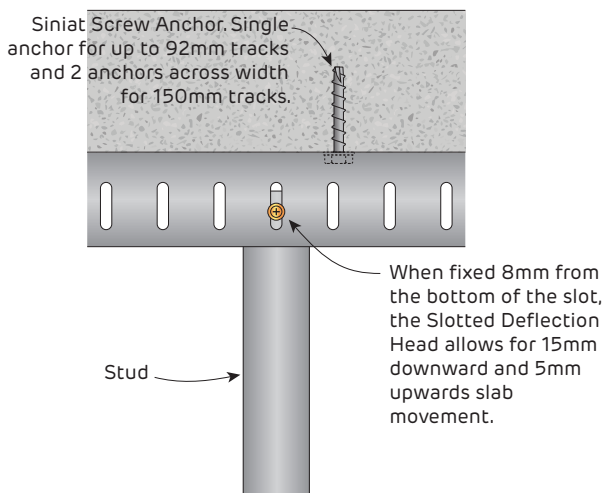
Wall Head Slotted Deflection Head Track Elevation
